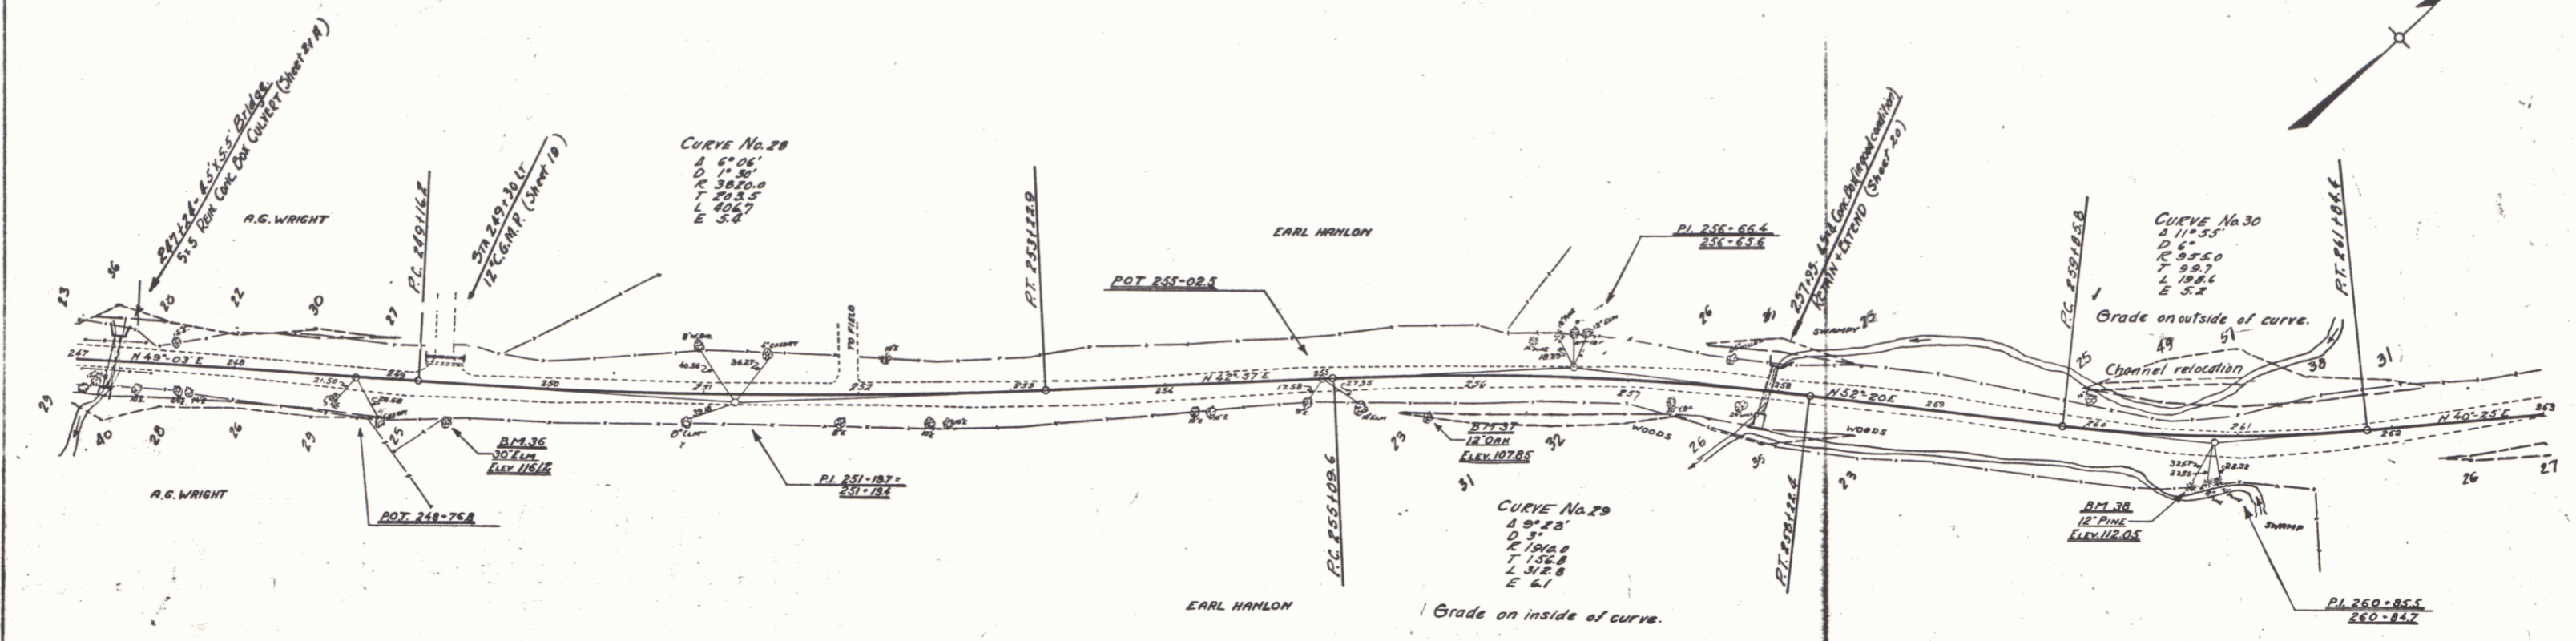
PLAN PROFILE & P.M.S. & C. STATIONS
